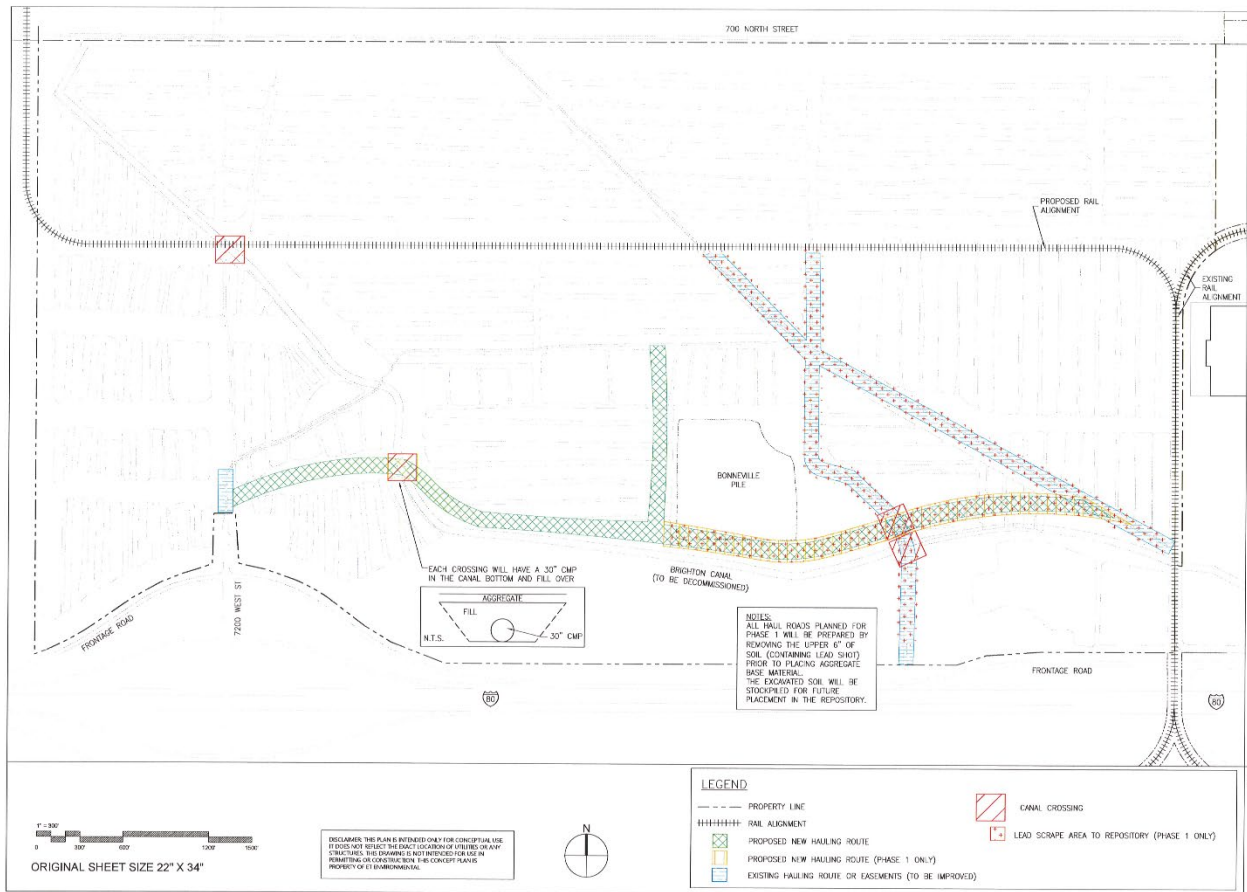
Material Hauling Plan (See Also Appendix A-22)
